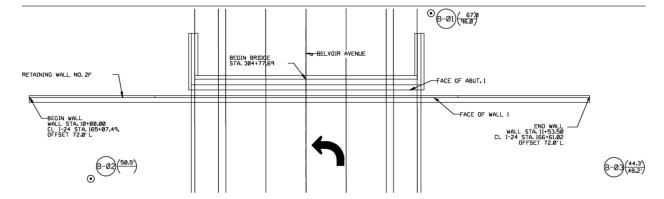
Excerpt of KSWA Retaining Wall Boring Location Plan
